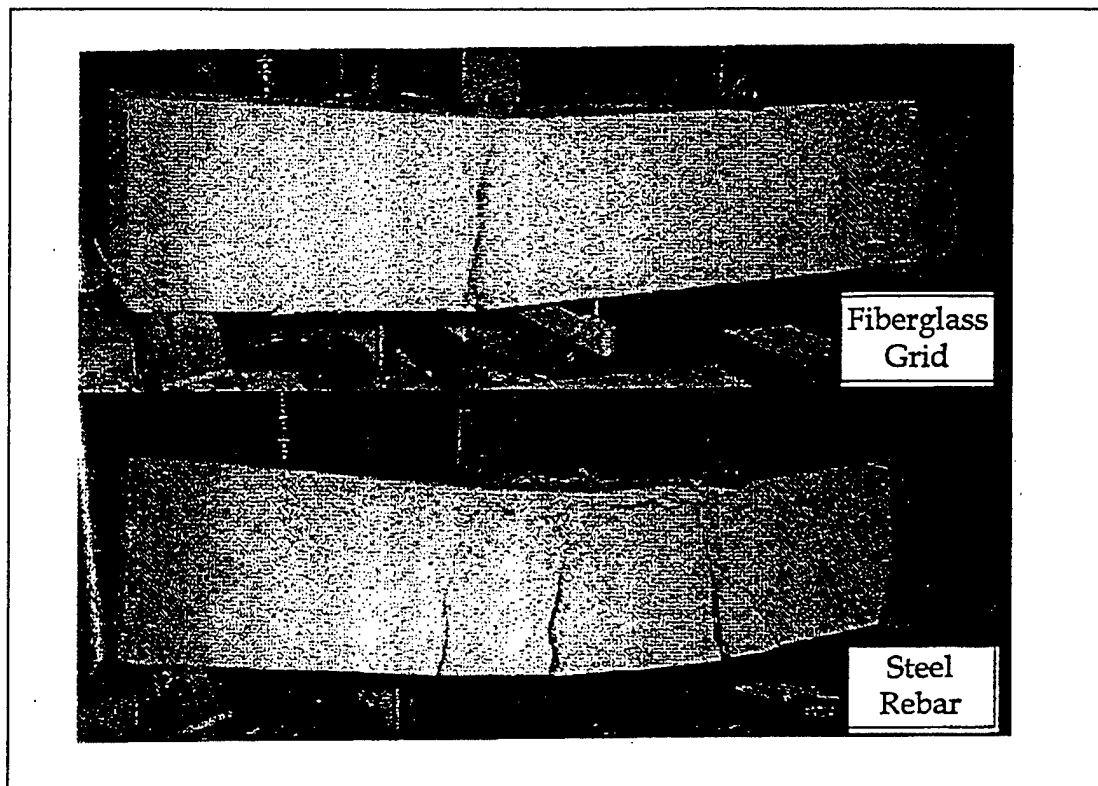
Uneven crack distribution in grid-reinforced concrete.
